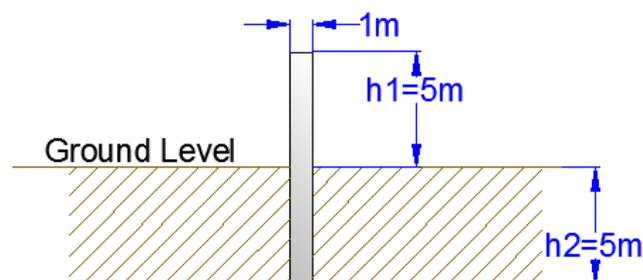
Typical Floodwall Cross Section Applied to Shanghai
